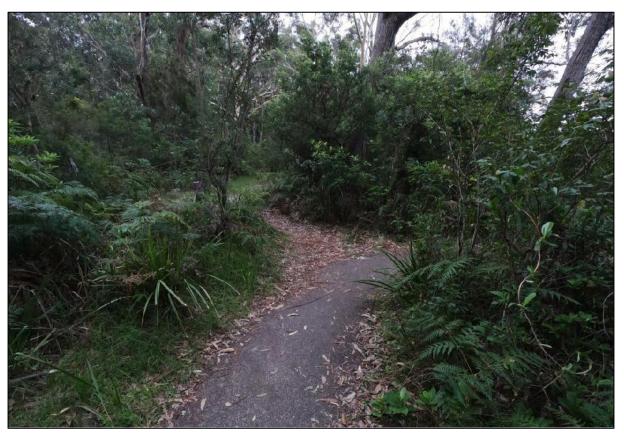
Northern end of existing concrete path where it joins landward end of boardwalk (not visible on right). Hardstand for assembly of boardwalk components would be established in coastal sand vegetation here.
